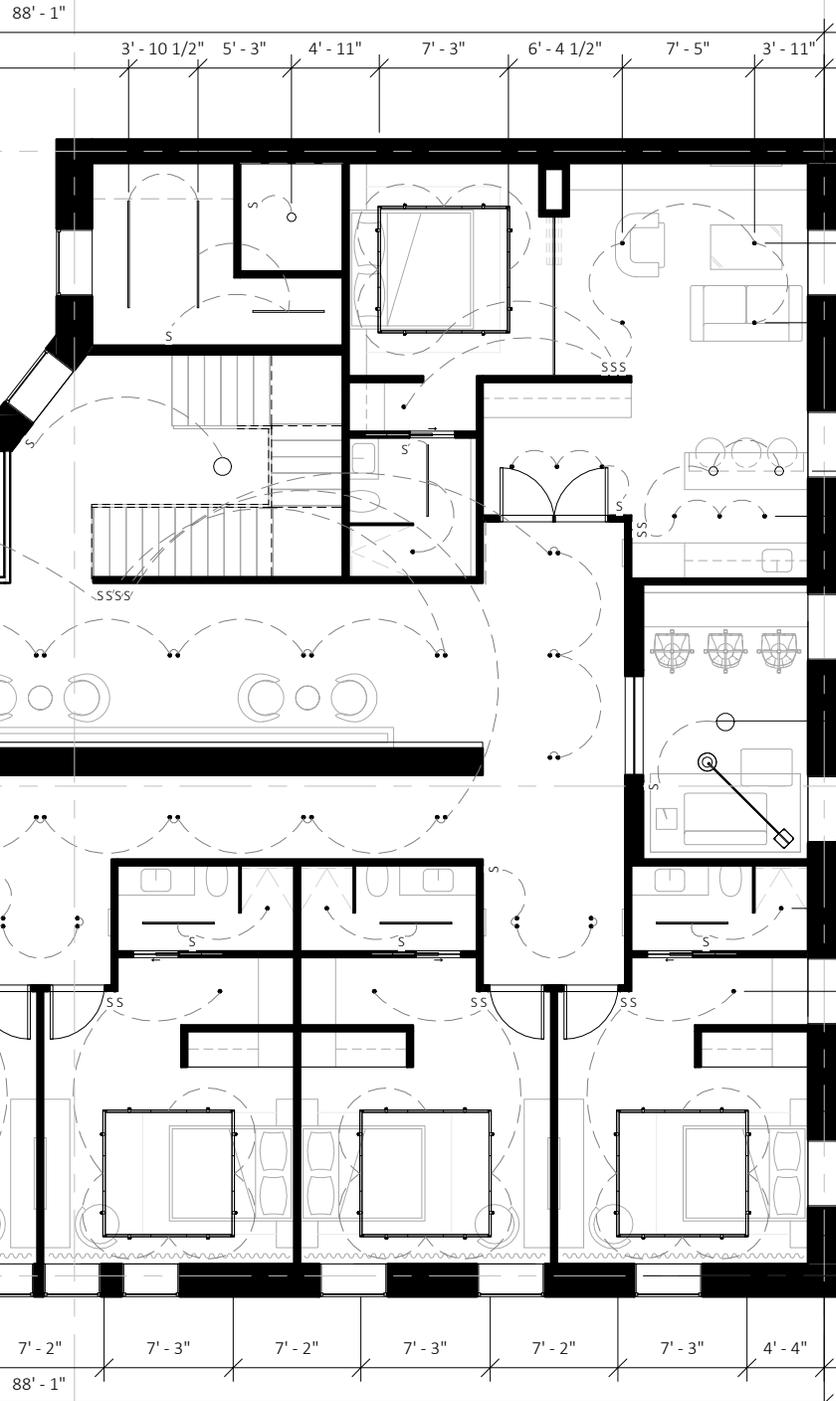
Second-Fifth Level Reflected Ceiling Plan
